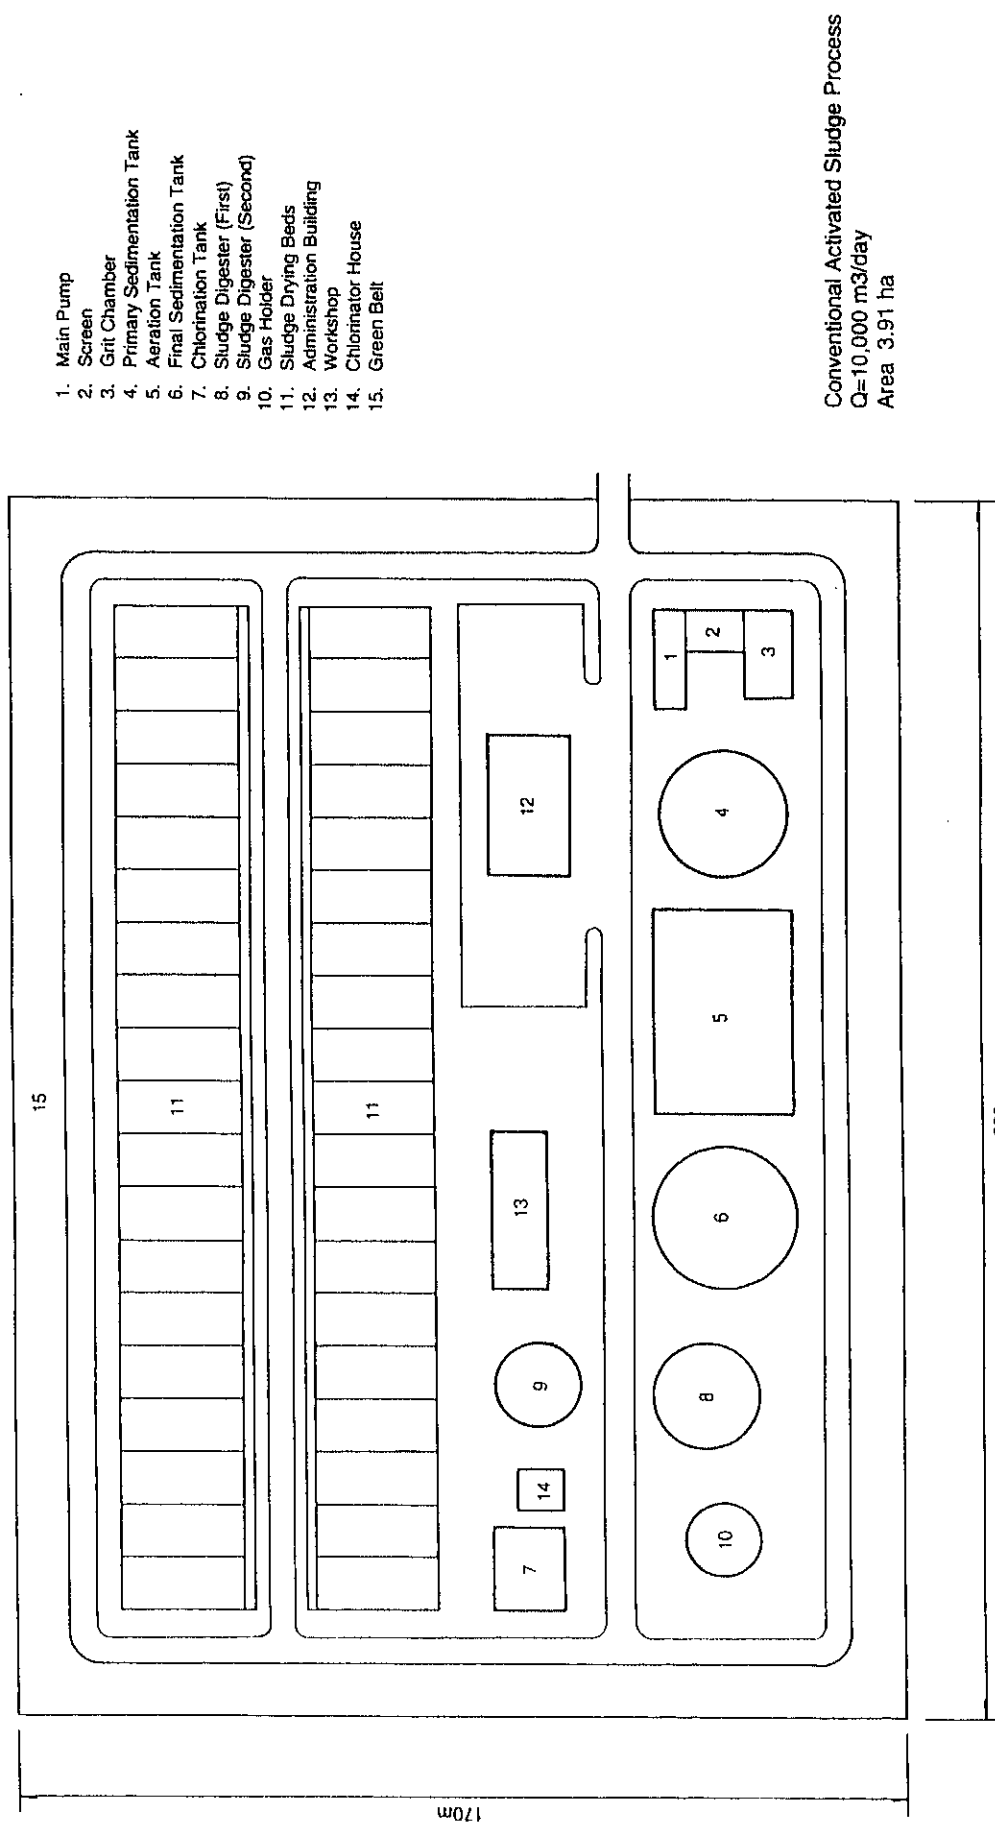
GENERAL PLAN OF TREATMENT PLANT
